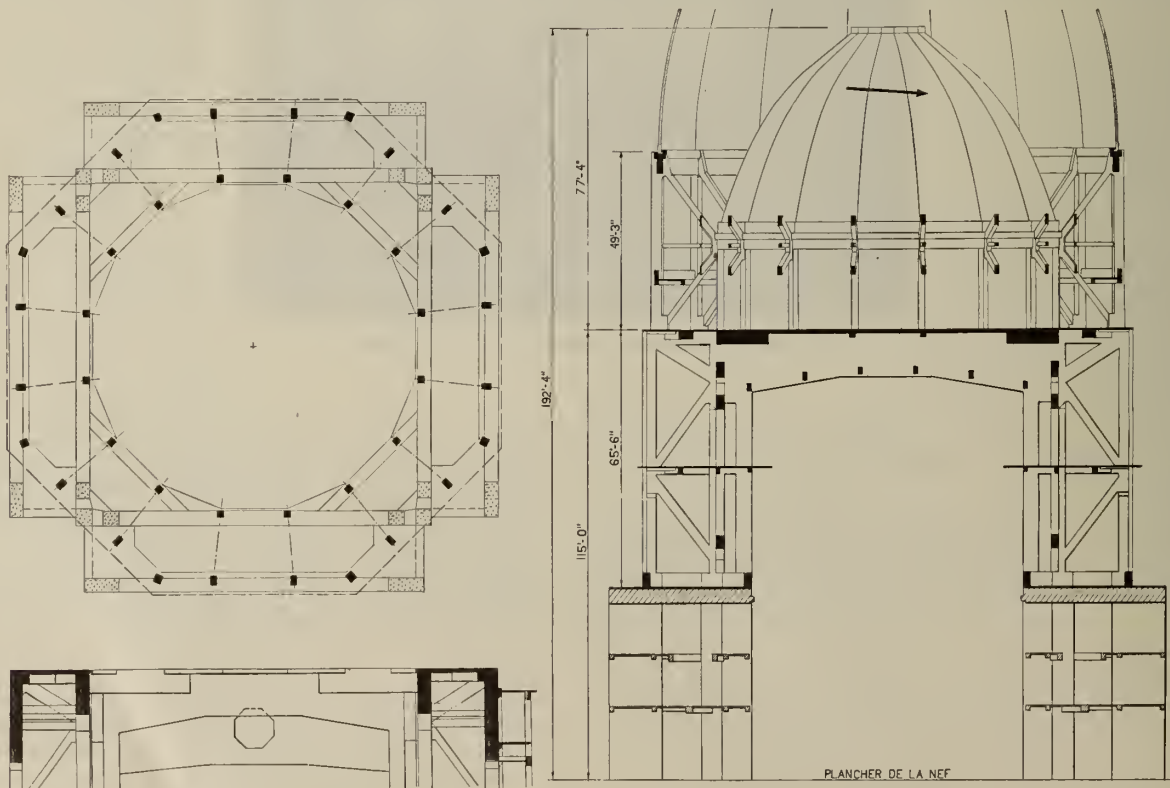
Plan and Elevation of Columns and Wind-bracings of the Domes
